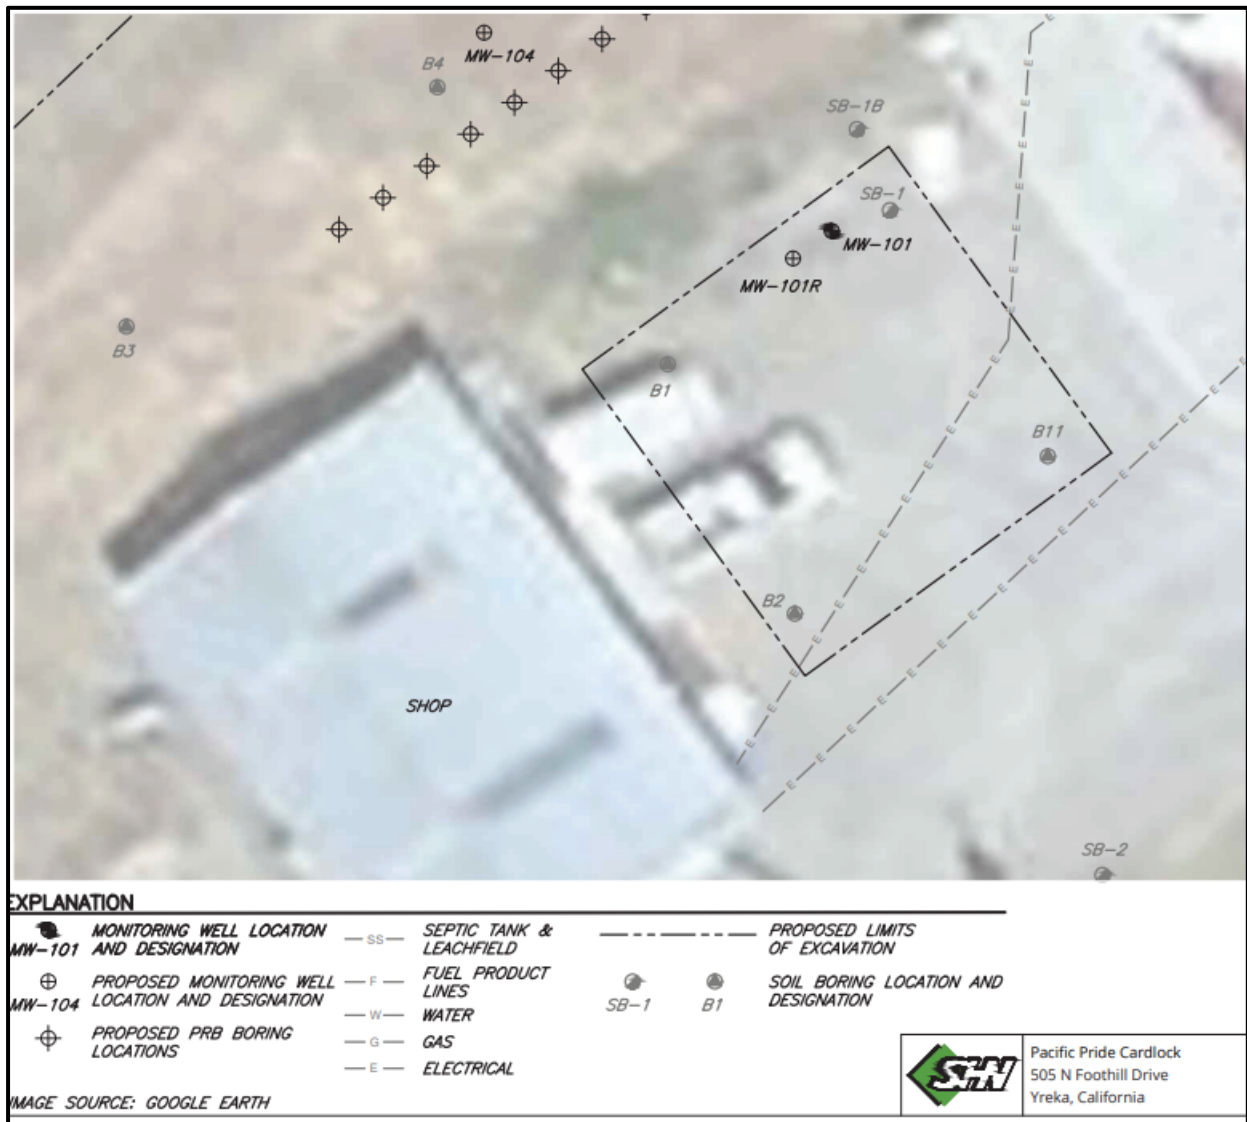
Site Plan (Figure excerpted from SHN’s “Remedial Action Work Plan” dated August 21, 2025.)
